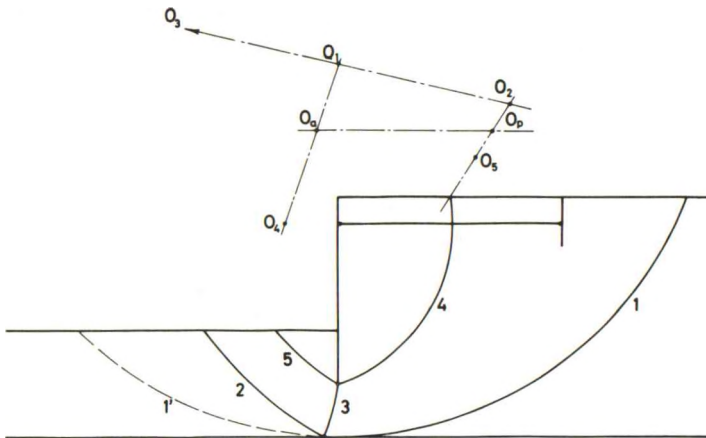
F: An Earth Pressure Problem Modified by a Total Stability Failure under the Sheet Wall.
